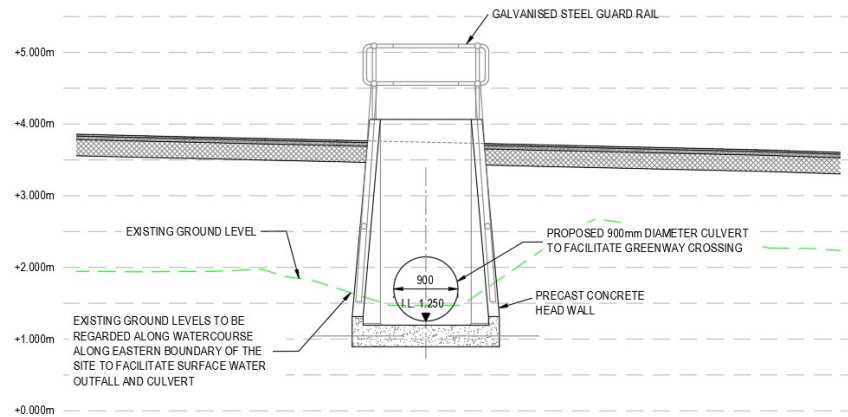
Proposed Cross section of Culvert Crossing to accommodate Greenway Infrastructure (Refer to DOBA Engineering drawing 2432-DOB-XX-SI-RP-C-1210)
